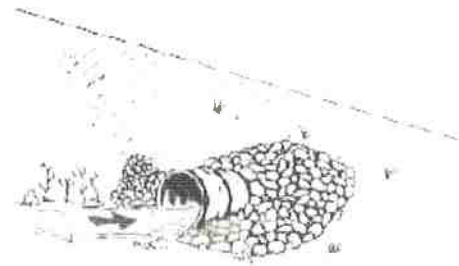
B. Riprap armor at culvert inlet (Kohler and Stetzel, 2003).
